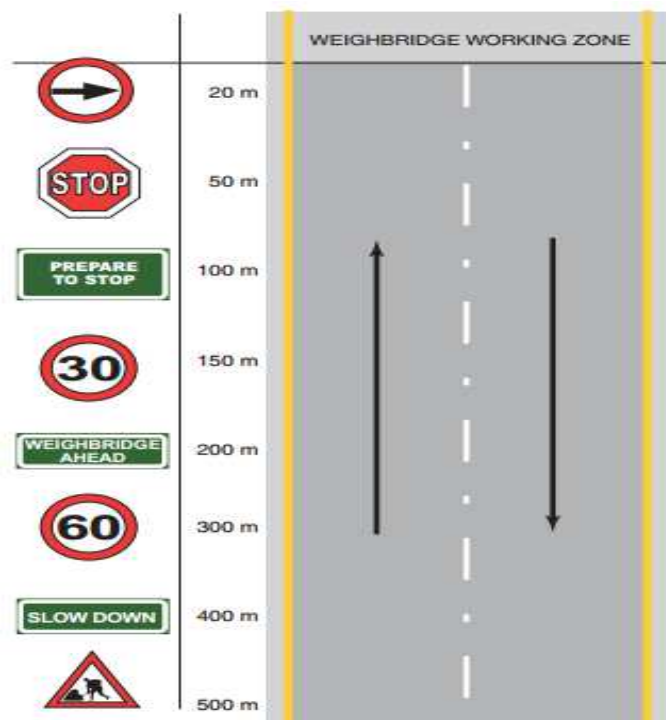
Typical road sign layout for axle load control survey sites<sup>8</sup>
